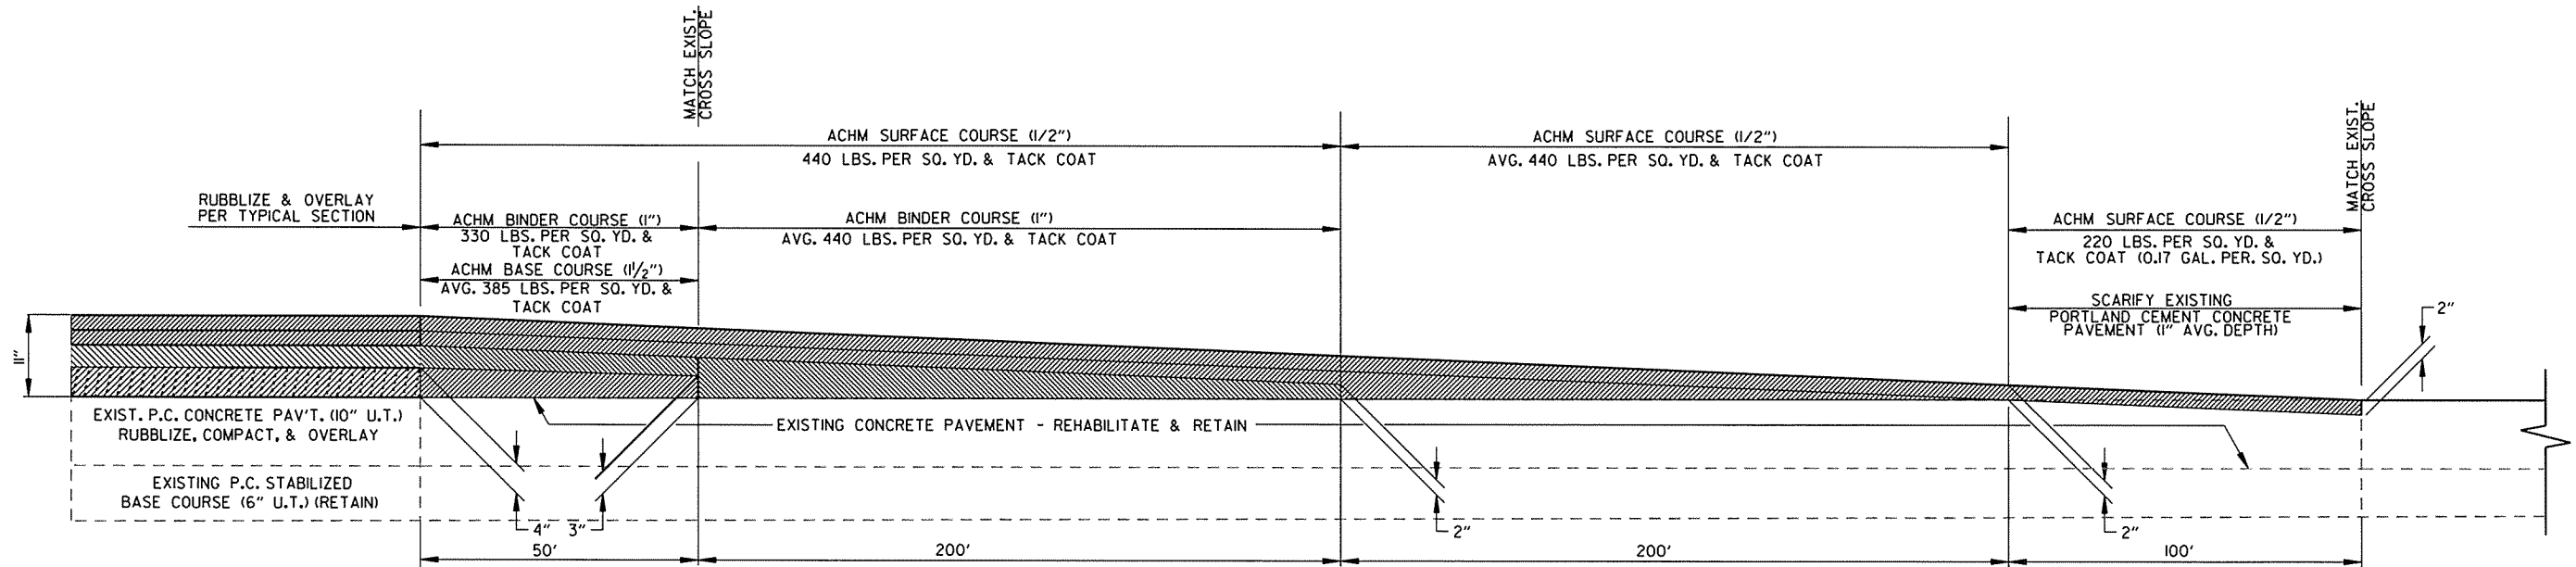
DETAIL OF TRANSITION TO EXISTING PAVEMENT SECTION AT BEGINNING OF PROJECT
